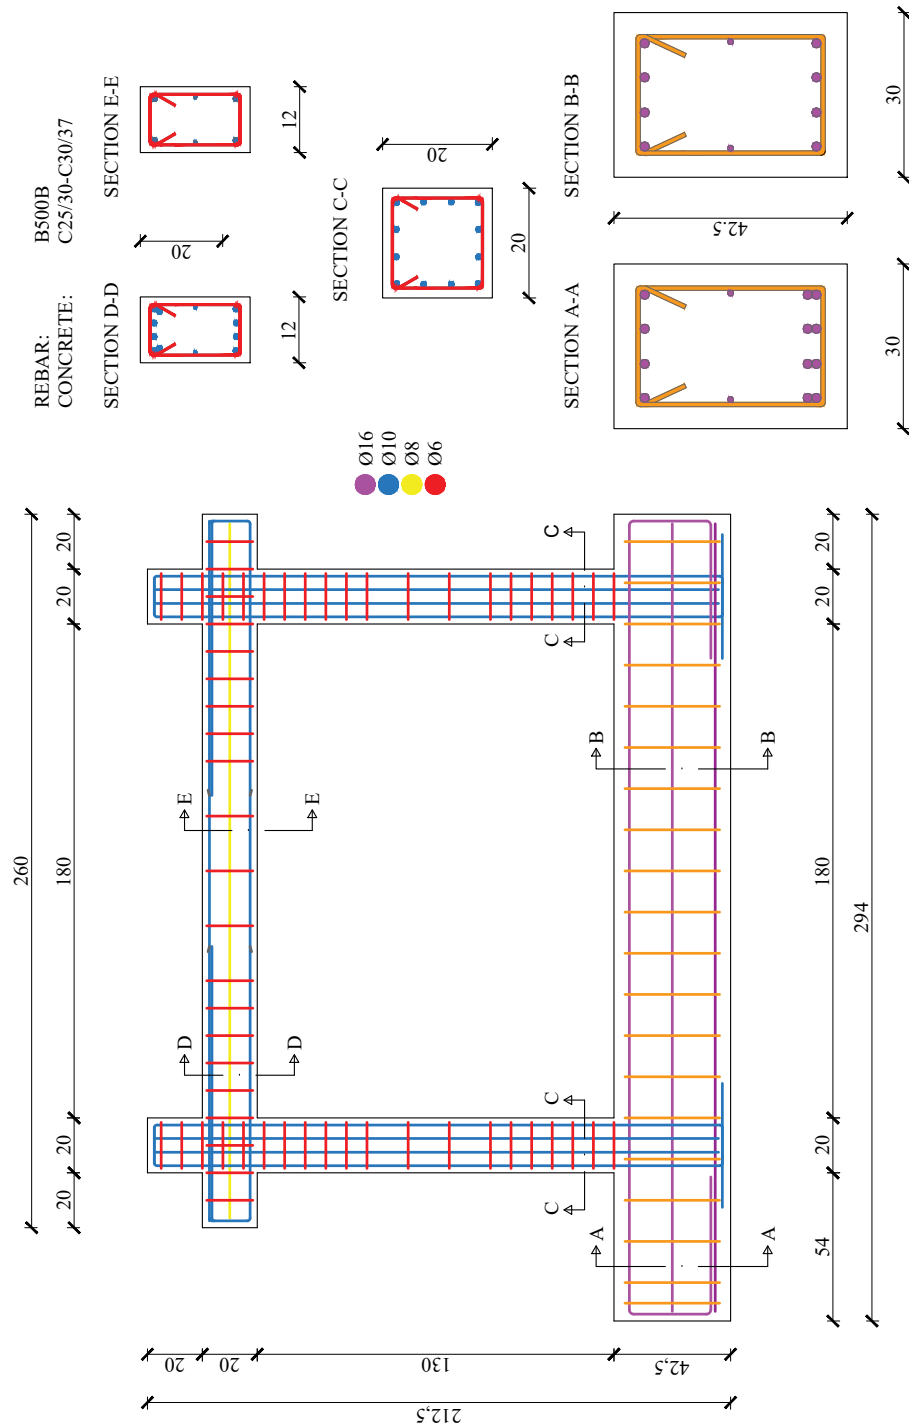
Specimen frame reinforcement design (Zovkić, 2013)
